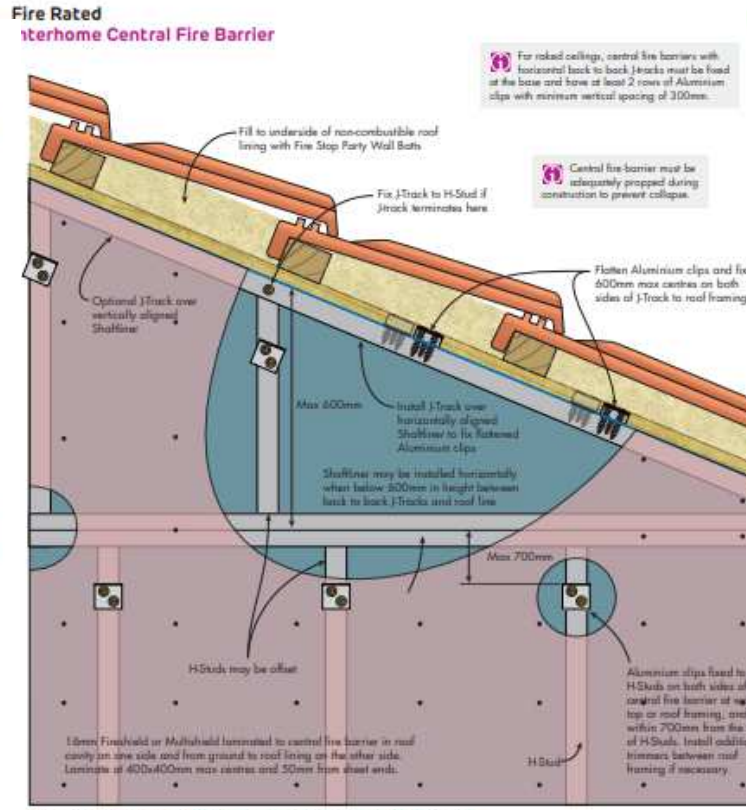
Interhome with Horizontal Shaftliner to Roof Line
